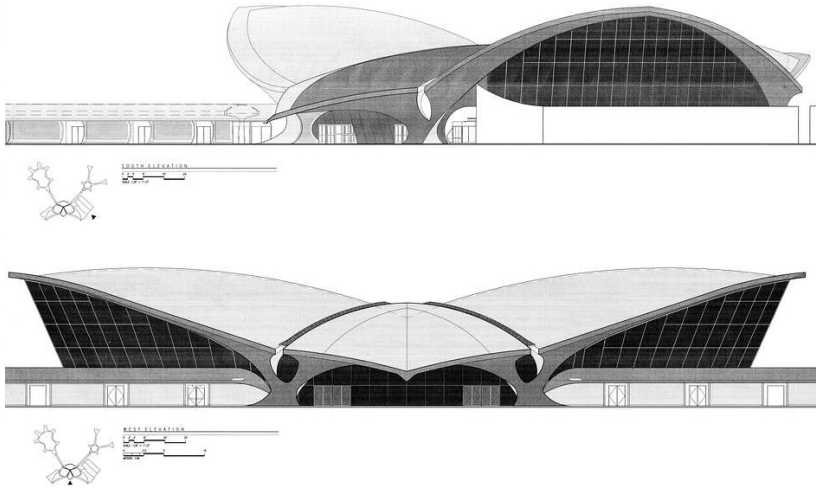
Two of the elevation drawings for the TWA terminal building used to recreate a simplified column geometry. Other drawings seem to suggest that the columns are solid concrete. See attribution in the figure credits list.
